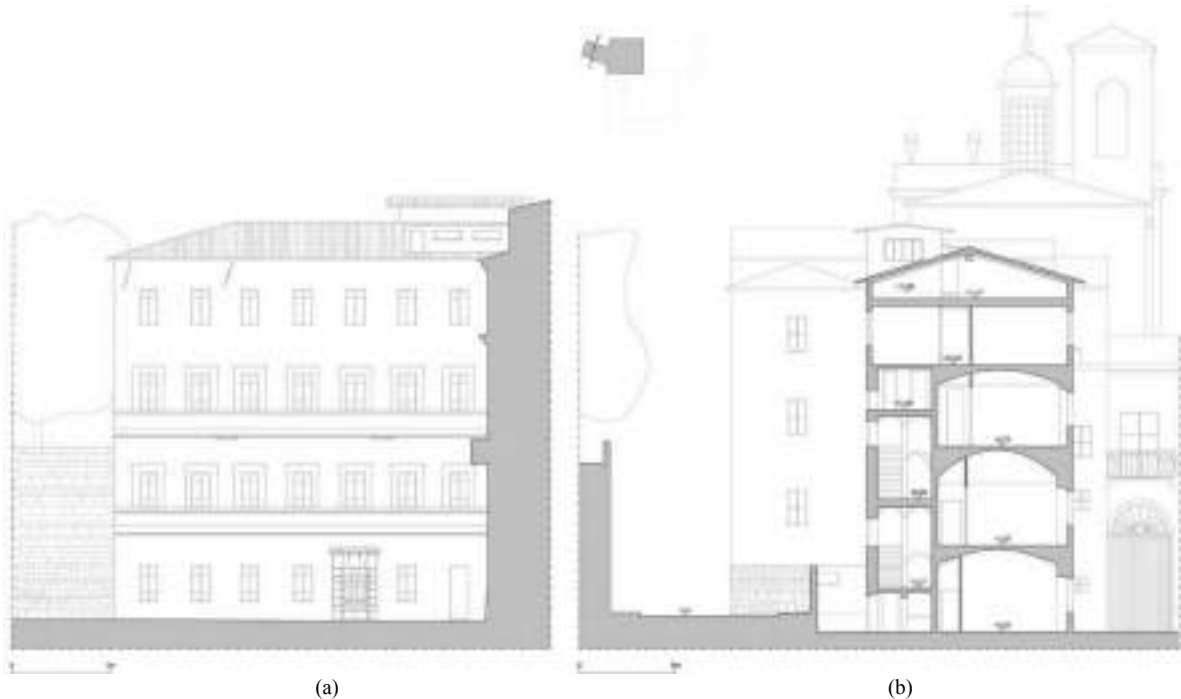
Extract of the elevations and sections drawn up during the survey activities: (a) Southwest elevation; (b) Cross-section.
